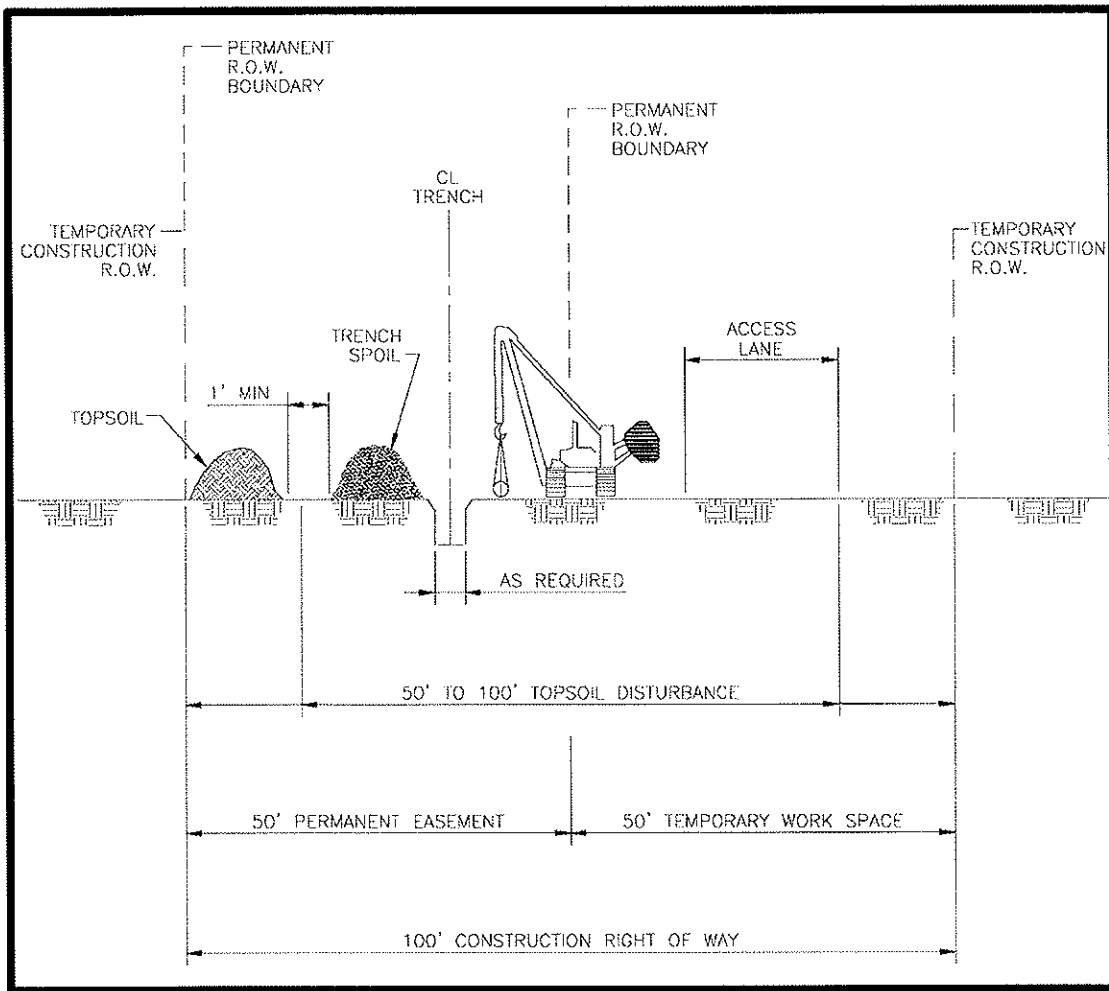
TYPICAL ROW CROSS SECTION
